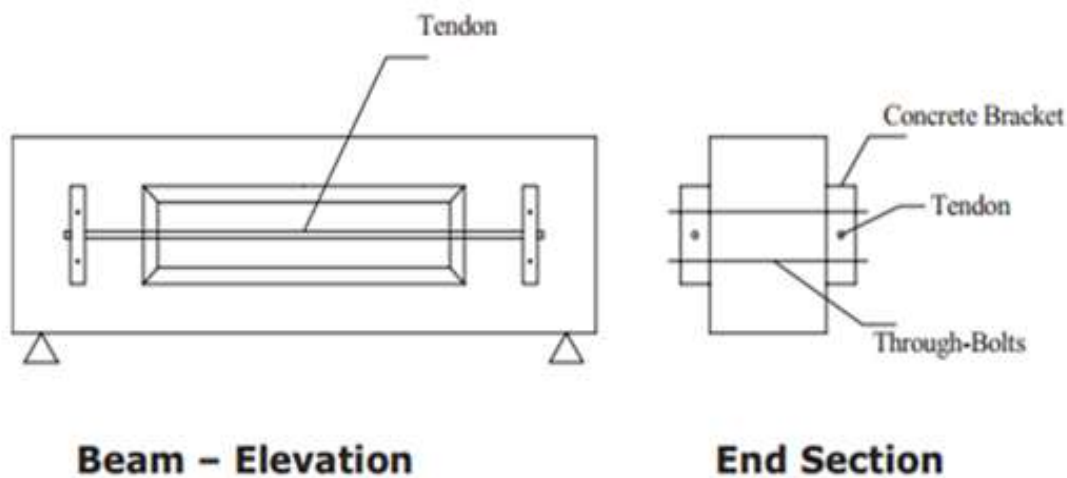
Anchoring of external prestressing using through bolts. (Chen S., 2005).
